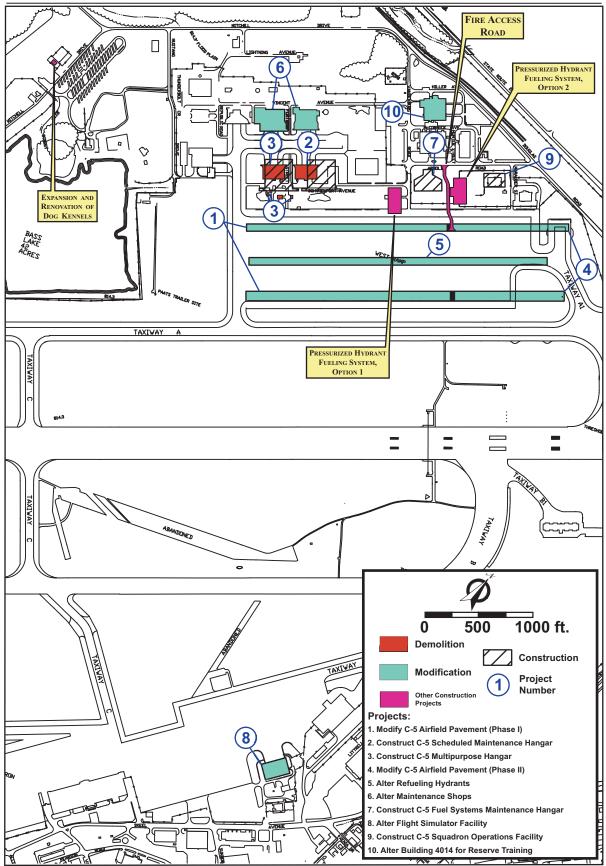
Proposed Construction and Other Construction Projects in the ROI at Wright-Patterson AFB
